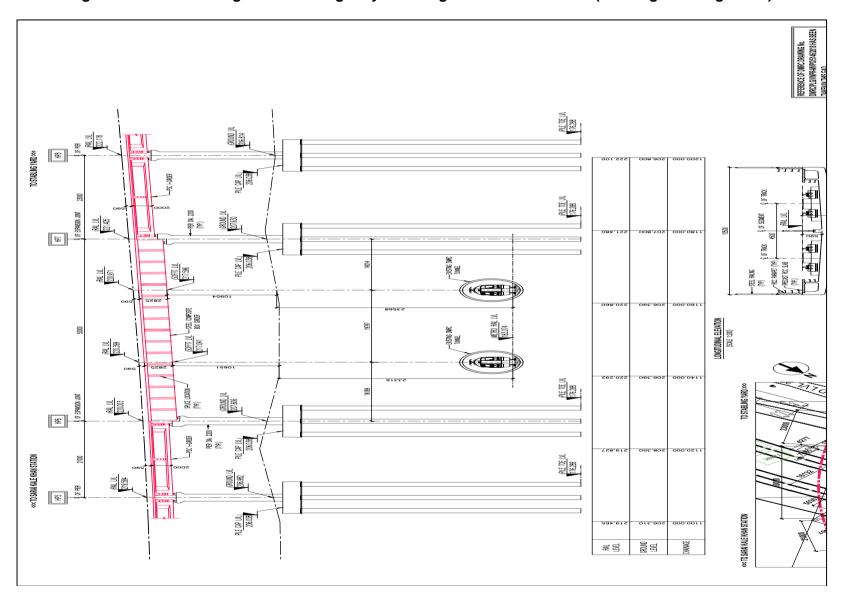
General Arrangement of Obligatory Crossings over DMRC Tunnel (Stabling Yard alignment)
